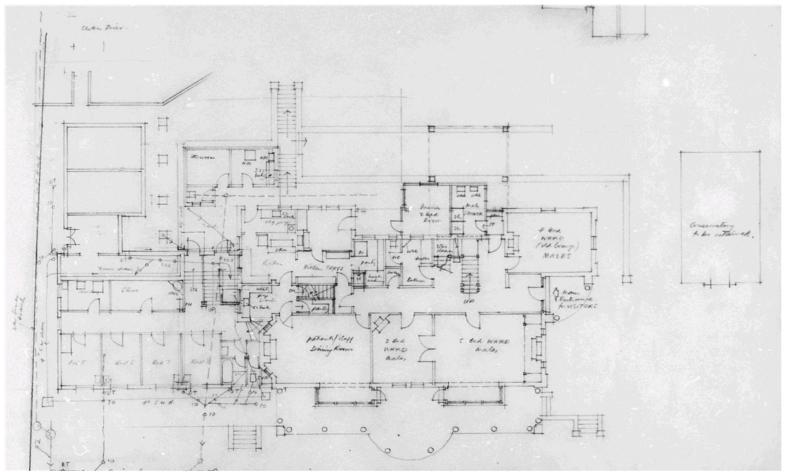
Ground floor plan and proposed extensions 1960s. Tasmanian Archive and Heritage Office AE417.
